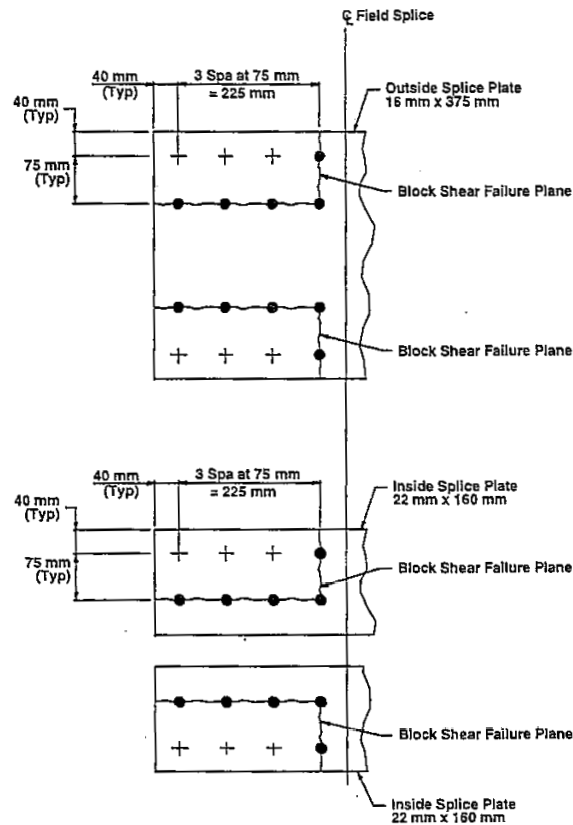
Block Shear Rupture - Bottom Flange Splice Plates
